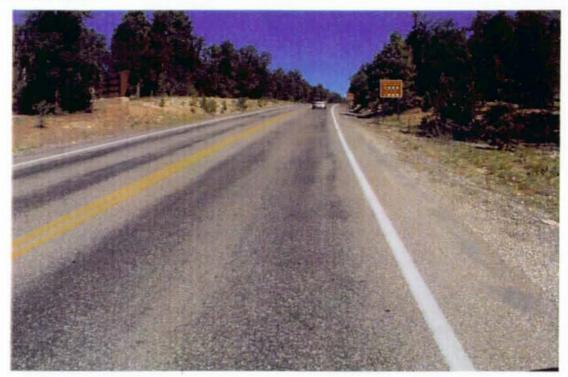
MP 0.00 - Begin route at South Park Boundary.
